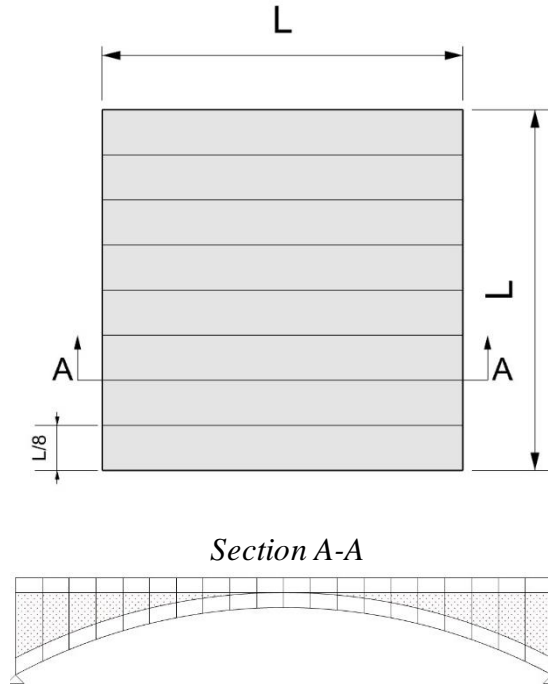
Plan view of proposed system (a) elevation view of Section A-A (b)
